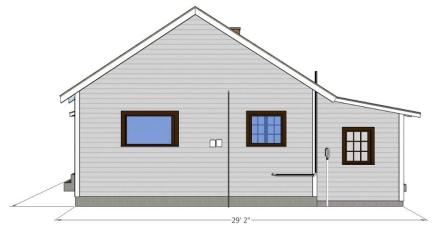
Measured drawing of west elevation of Assistant Ranger Dwelling.
